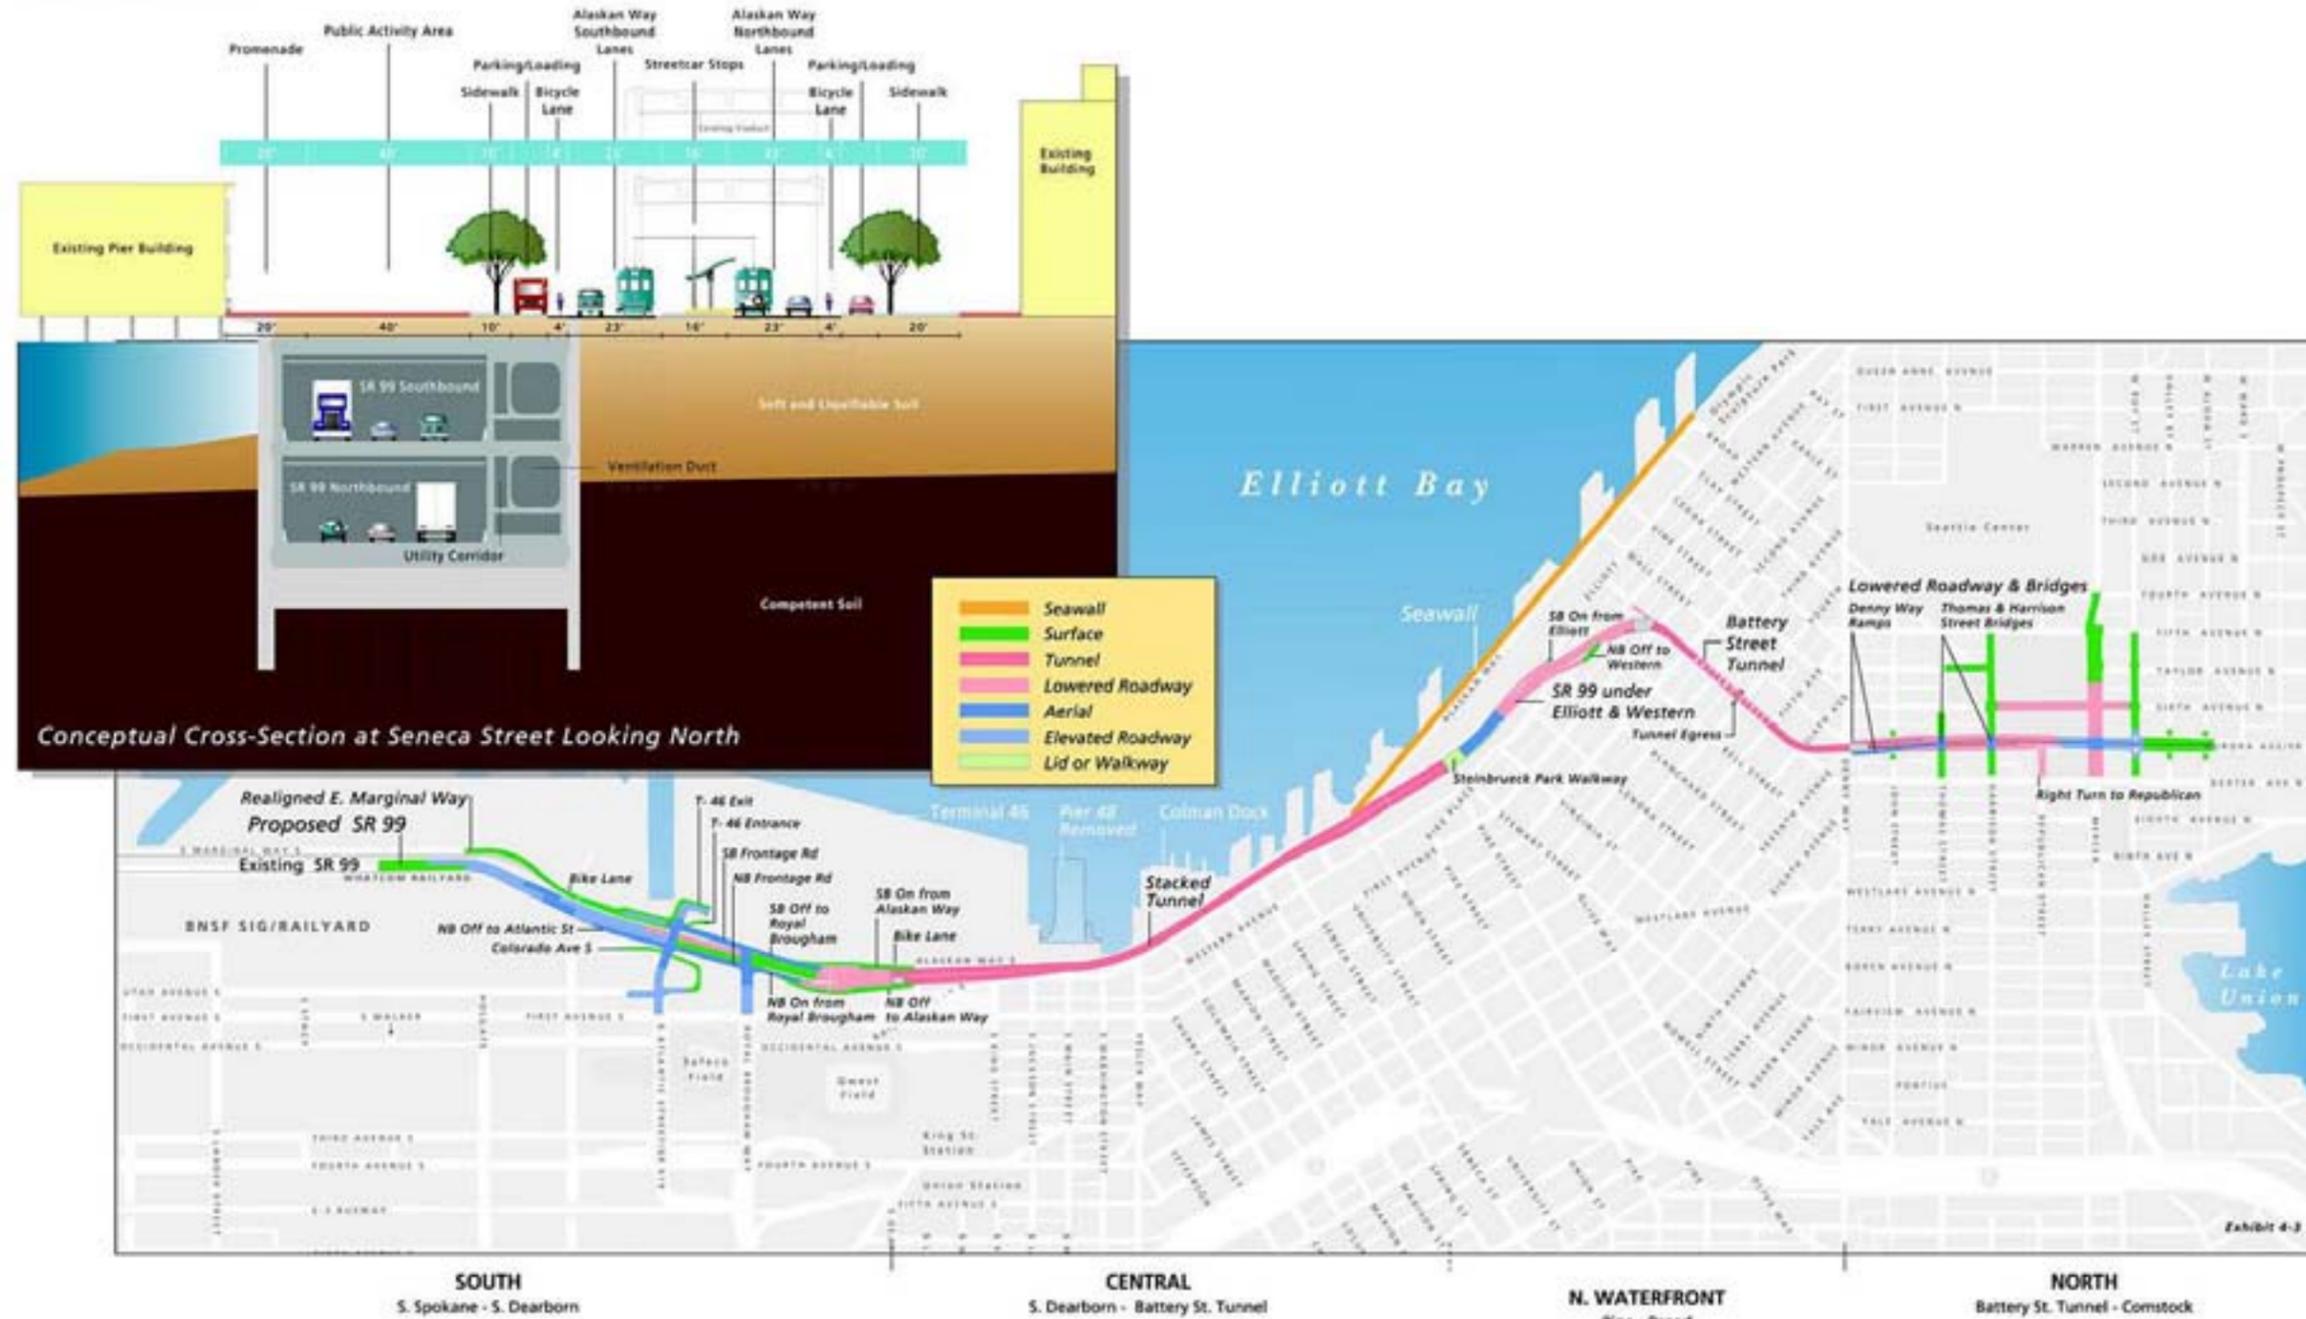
shows the Tunnel Alternative and a cross section of the Alaskan Way surface street.
